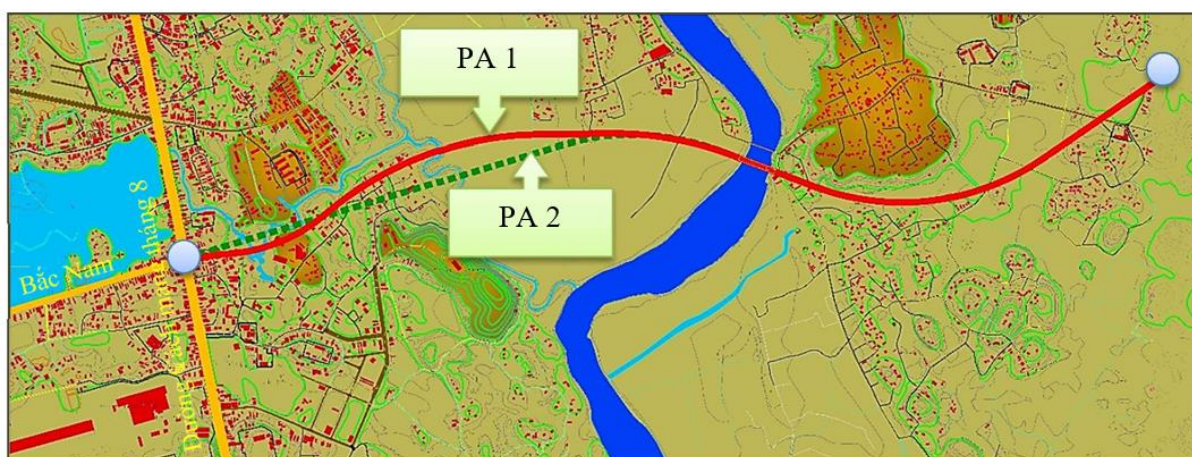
The proposed alignment alternative of Southnorth road and Huong Thuong Bridge
